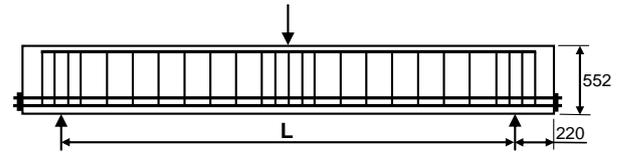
Vecchio and Shim's Beam Geometry and Reinforcement Layout. For more detailed information about the test set-up, refer to [13].
